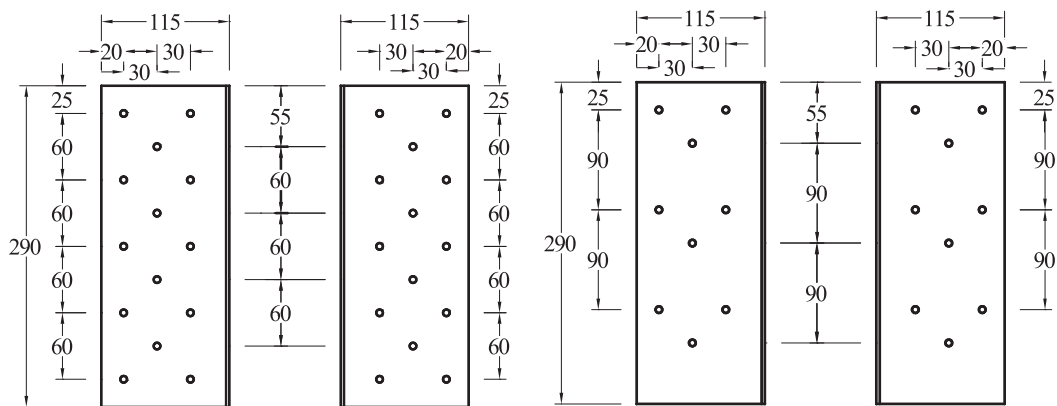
Design of L-type aluminum alloy connectors with 28 (left) and 18 (right) 6-mm self-tapping screws (units: mm).
